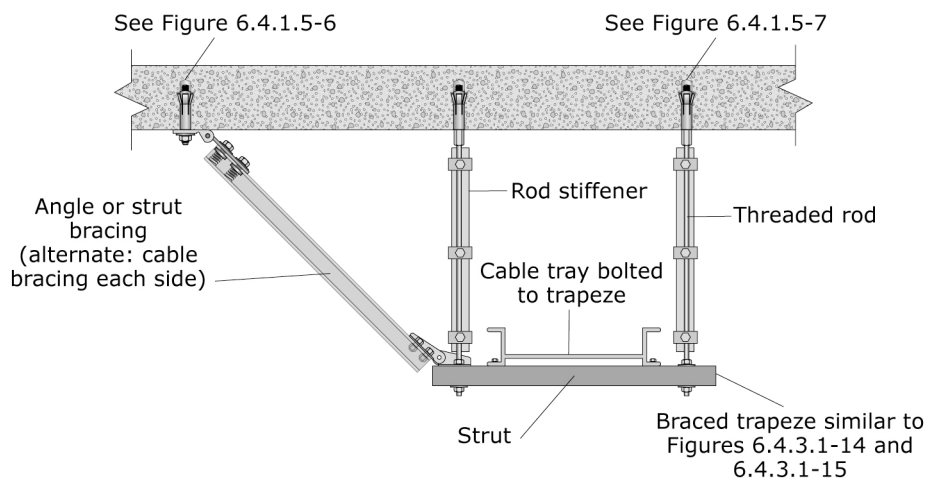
Cable tray on braced trapeze (ER).
